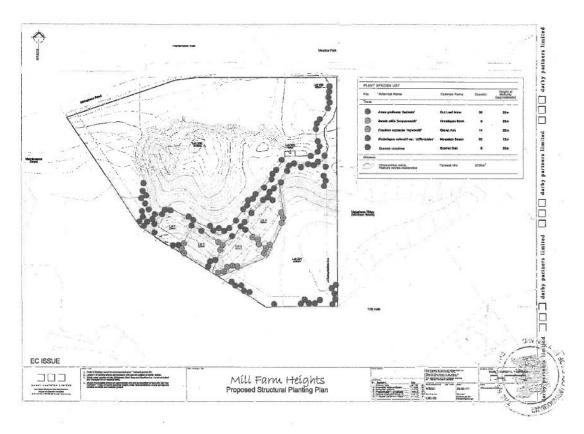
Approved 4 Lot Subdivision Structure Planting Plan (sourced from Environment Court decision).
